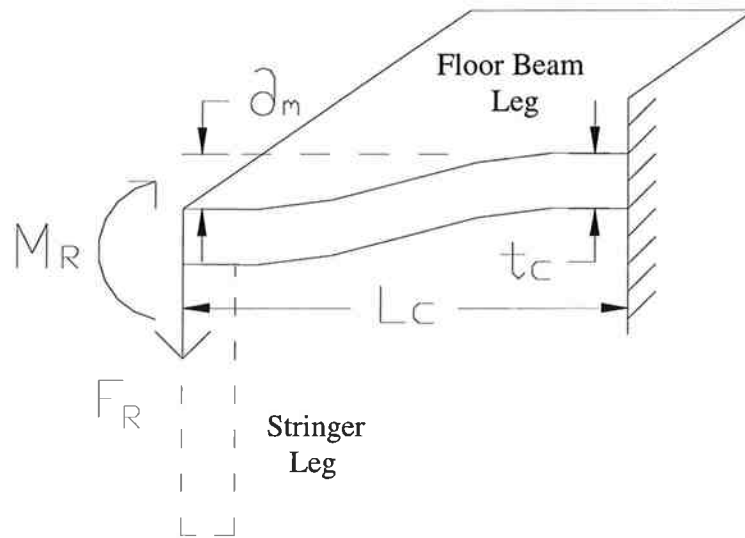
Top of the floor beam leg of the clip angle modeled as a cantilever beam.
